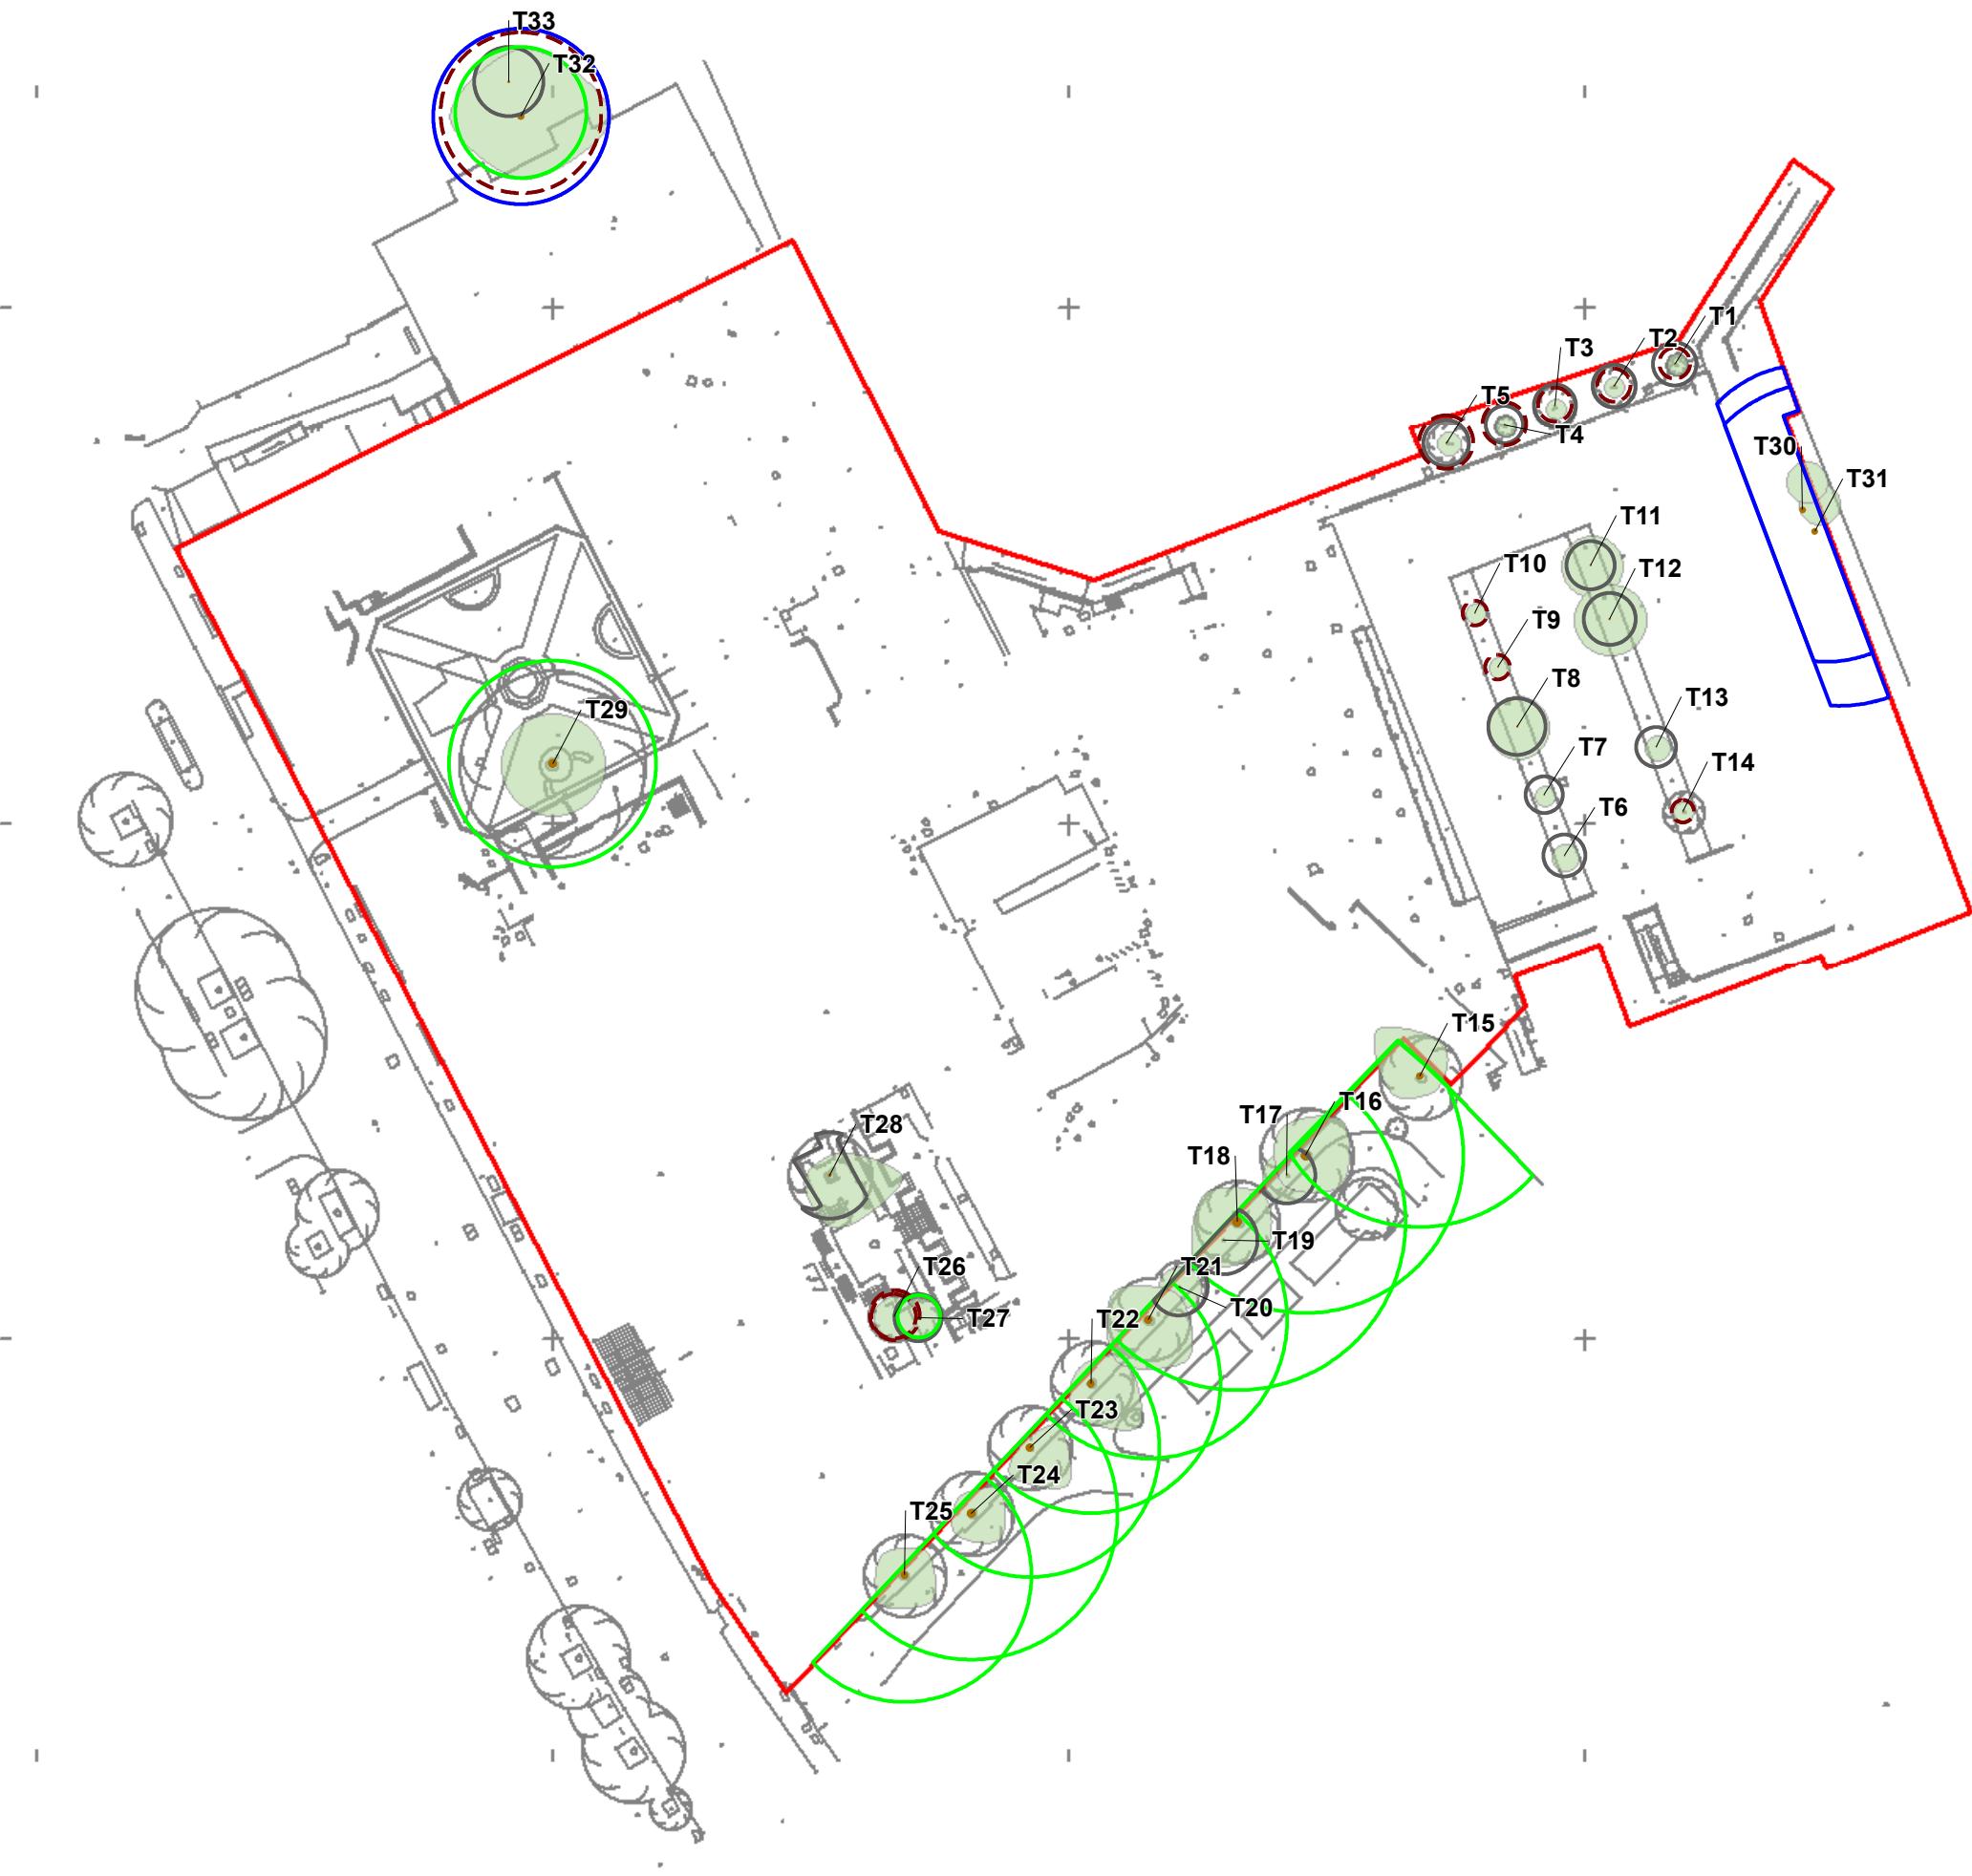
TREE CONSTRAINTS PLAN (TCP01)
